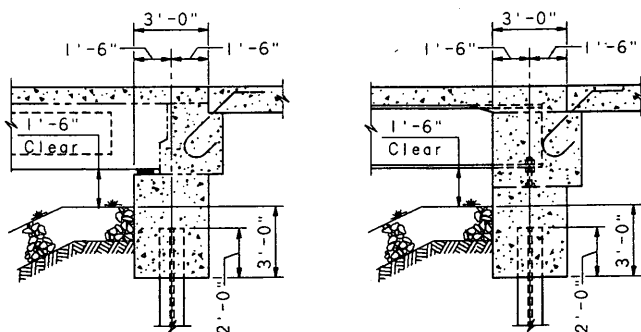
Capped-pile stub-type abutments for integral bridges: (left) for prestressed concrete box-beam stringers; (right) for steel I-beam stringers.
